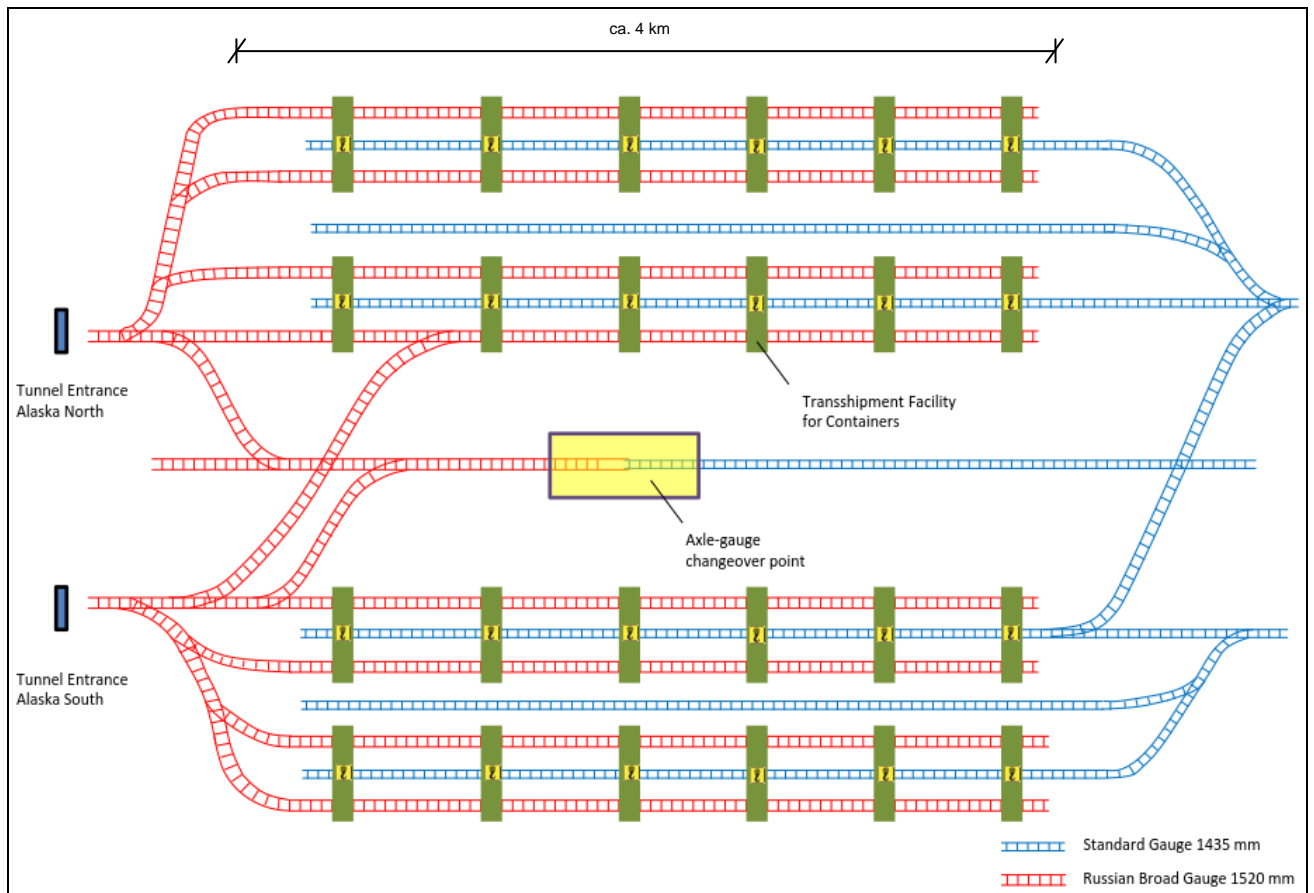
Potential transshipment facility layout including an axle-gauge changeover point at the Alaska tunnel entrance [17]
